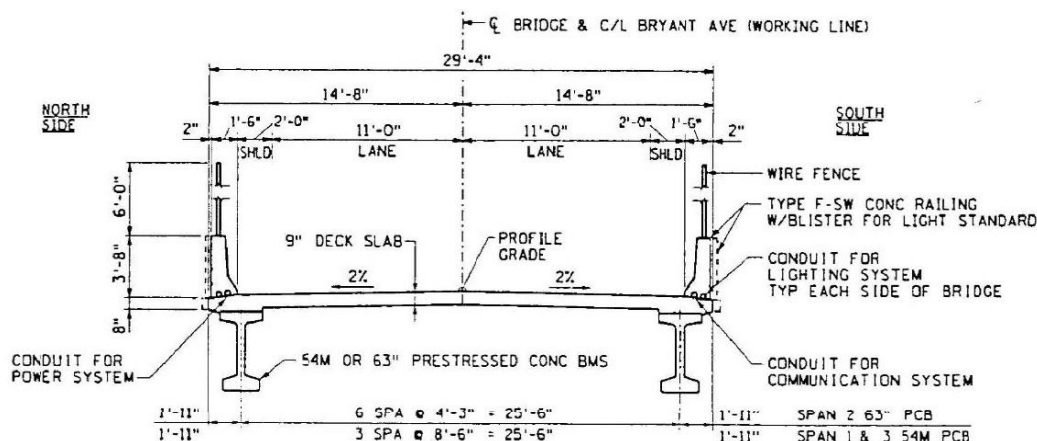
Existing Bridge No. 19544 Transverse Section
